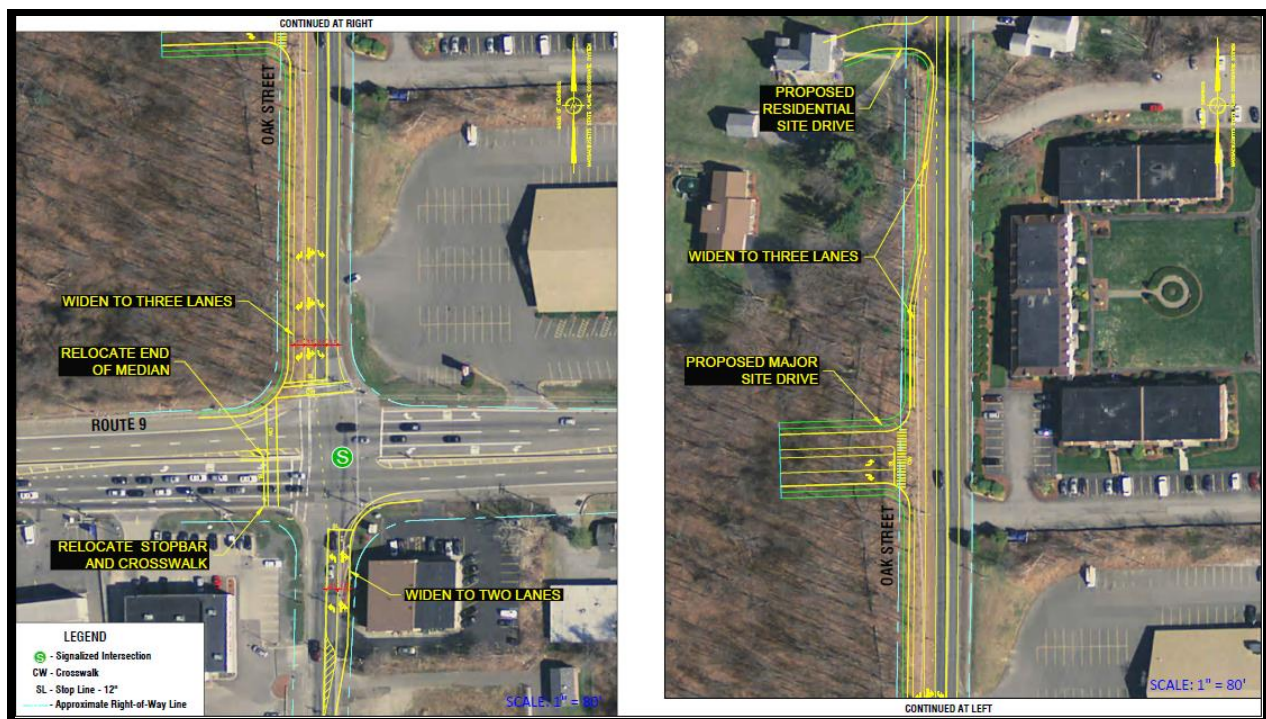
Conceptual Mitigation Plan Oak Street at Route 9
